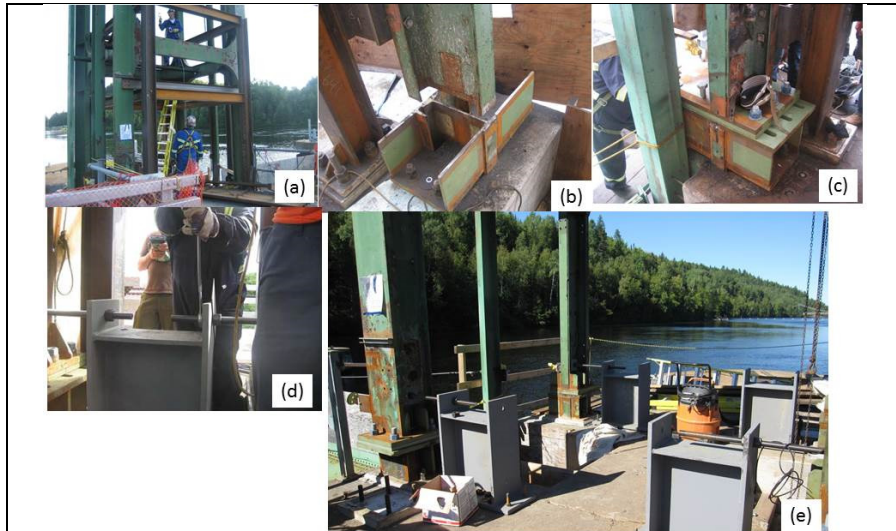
La Tuque hoist supporting structure: adjustable fixed end
